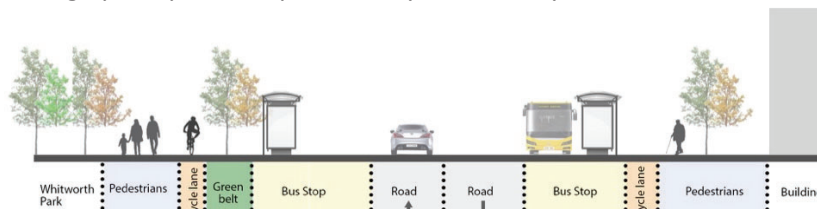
The street section of Oxford Road shows Dutch-style bike lanes (Source: Author)
